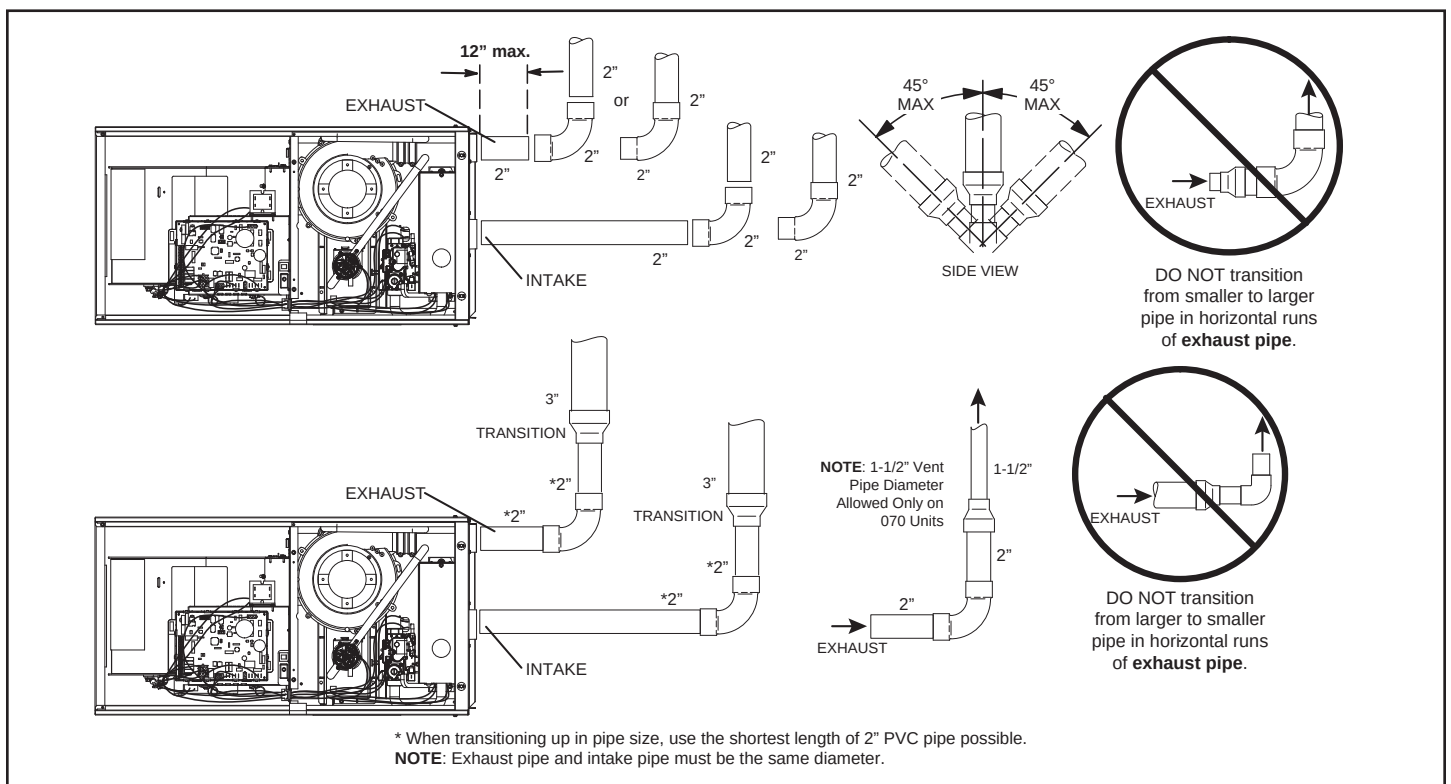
Typical Exhaust and Intake Pipe Connections and Condensate Trap Installation in Horizontal Air Applications (Right Hand Discharge Shown)
